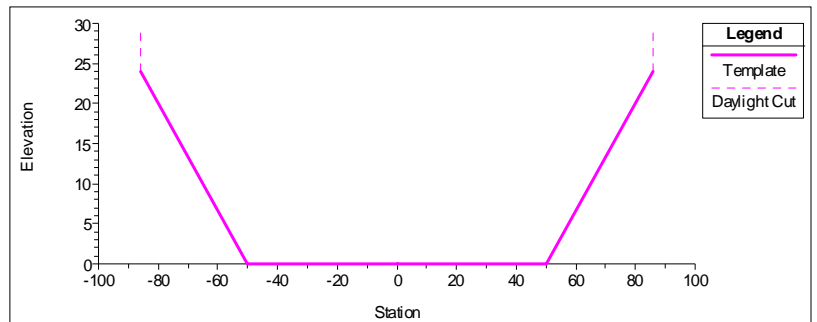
TYPICAL CROSS SECTION OF IMPROVEMENT FOR SCENARIO 2; SOUTH LEVEE (LEFT), NORTH LEVEE (RIGHT) (ELEVATIONS IN NAVD)
